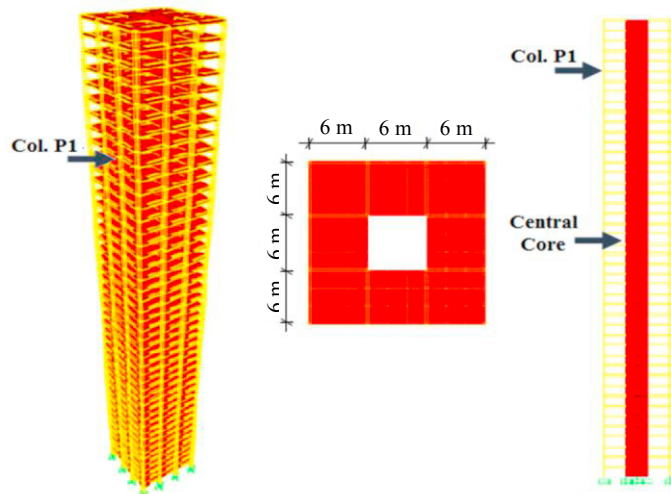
3D perspective, plan and elevation of the building analyzed.
